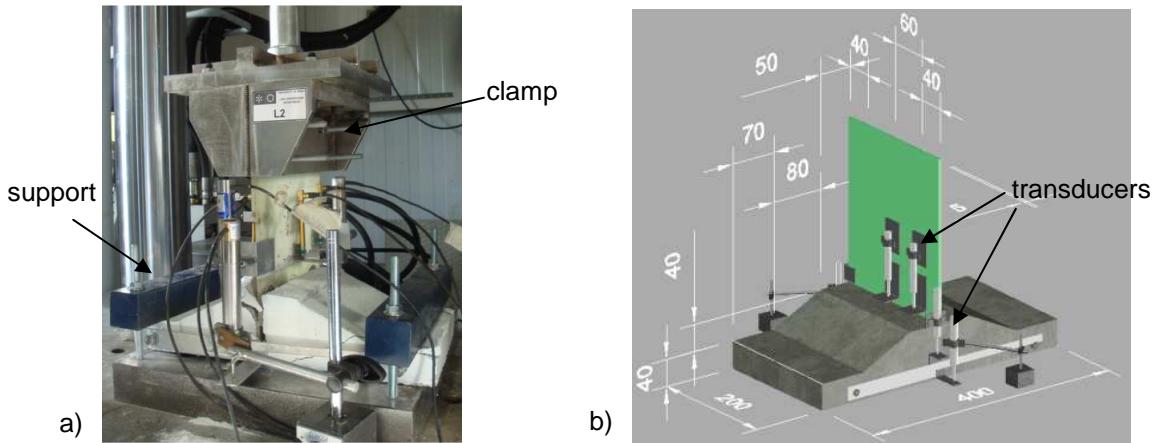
Pull-out test setup: a) overview, b) detail of pull-out specimens (dimensions in mm)
